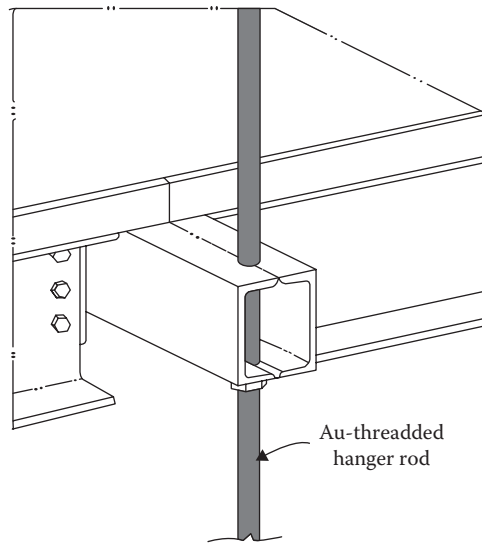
Box beam hanger detail: as designed, Hyatt Regency Hotel.
